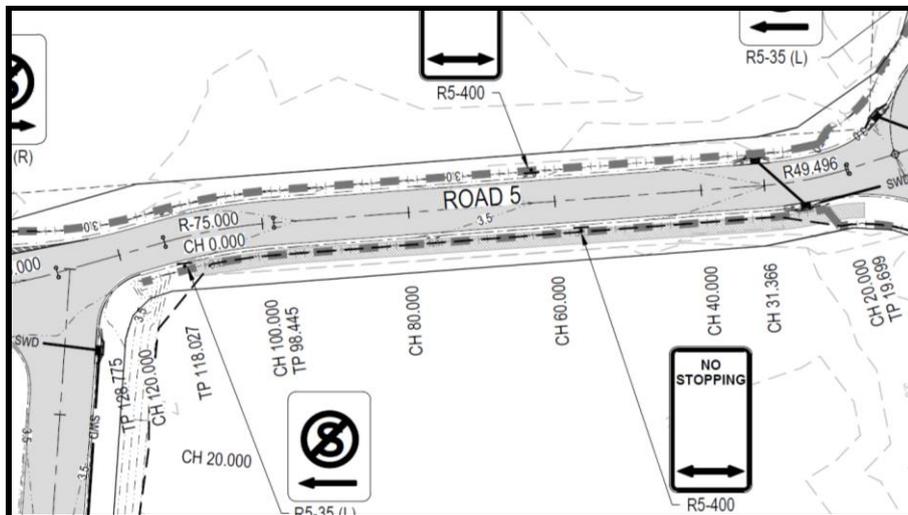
Proposed Road 5 adjoining Lot 137 (Source: Drawing C132 Arcadis 18 July 2019)
